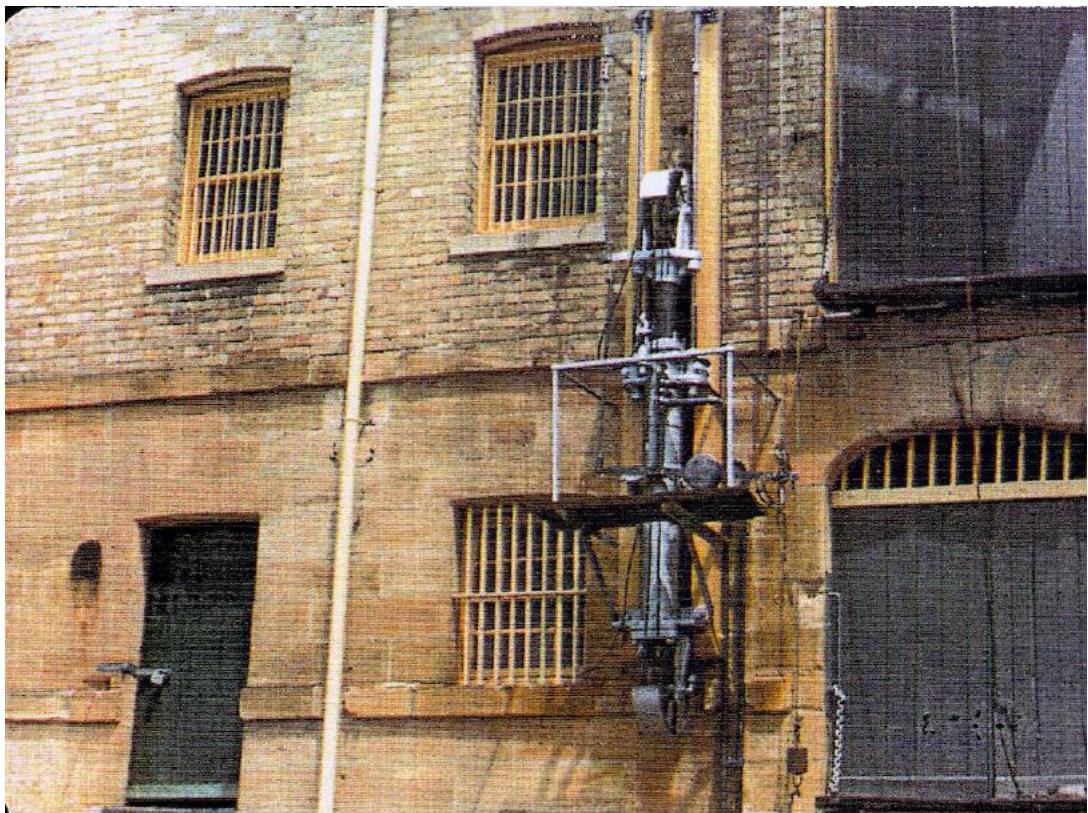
The hydraulic hoist outside Bay 1. Note the hoist is complete in almost all details, with the hoist cable, the activating lever and the activating lever cable intact. A similar hoist was outside Bay 8.
